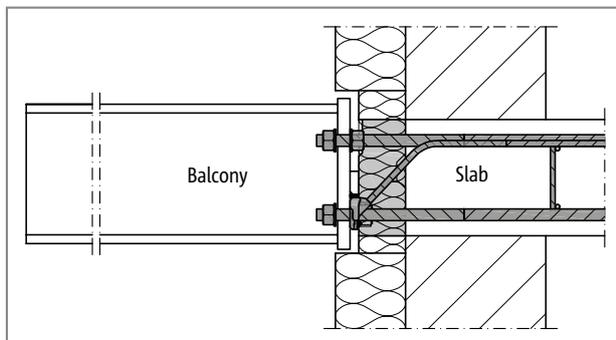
Schöck Isokorb® T type SK: Connection to the reinforced concrete floor; insulating element within the outer insulation
